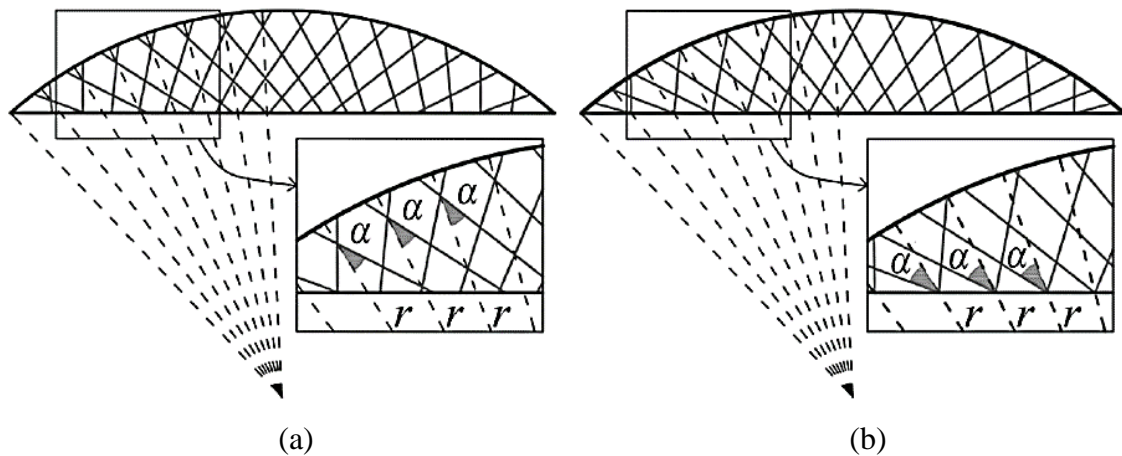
Radial hanger arrangement: (a) equal distribution on the arch; (b) equal distribution on the tie beam
